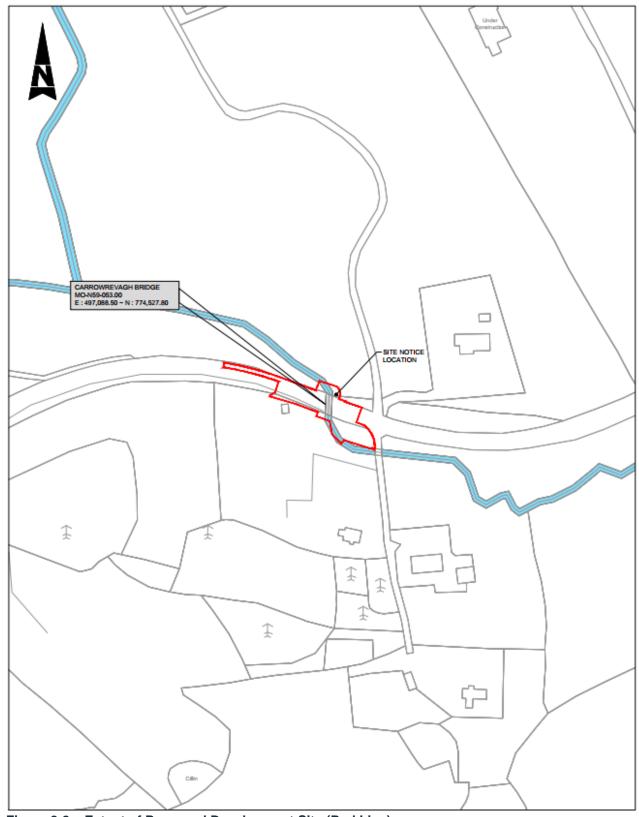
Extent of Proposed Development Site (Red Line)
